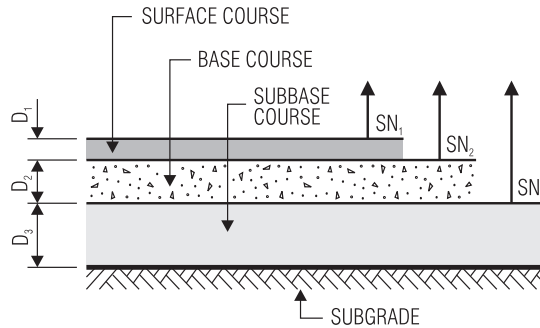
Composite of layers forming a flexible pavement. *SN* indicates structural number of a layer.
